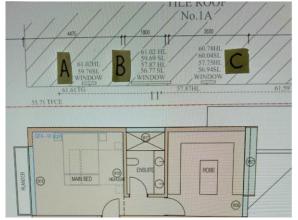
Proposed first floor addition and neighbouring windows at unit 4/1A Hewlett Street, labelled: A – kitchen window, B – Living room, C – bathroom window.
